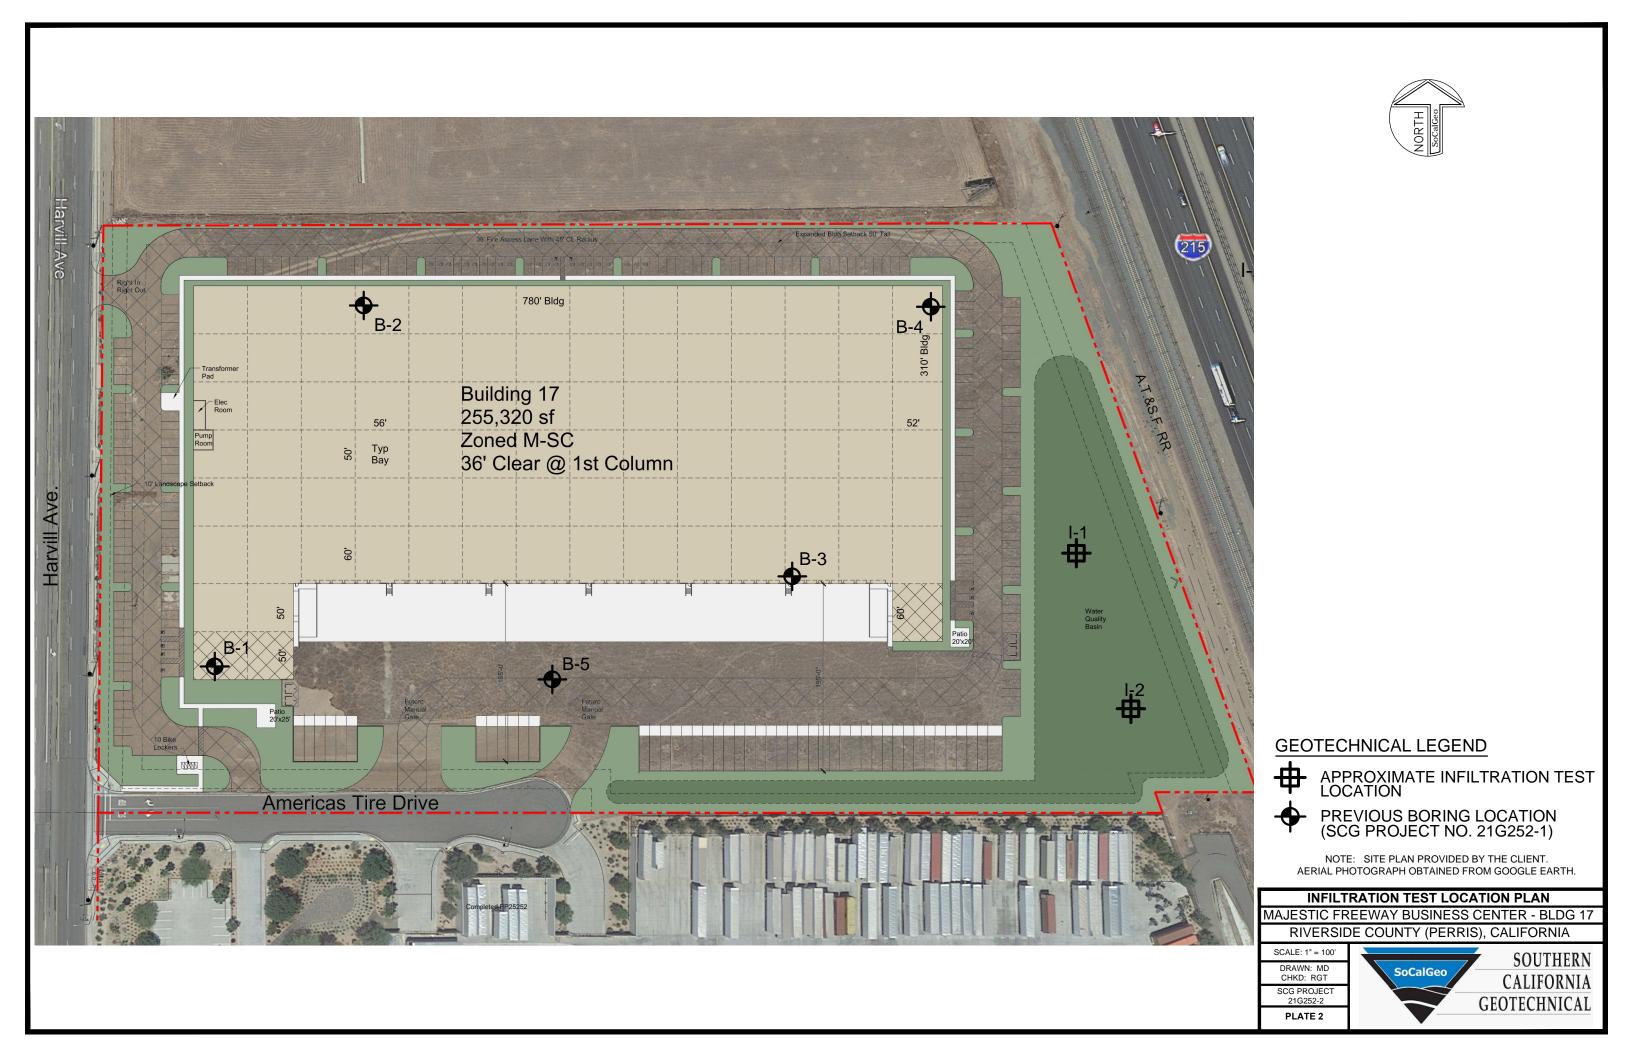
Infiltration Test Location Plan Boring Log Legend and Logs (4 pages)
